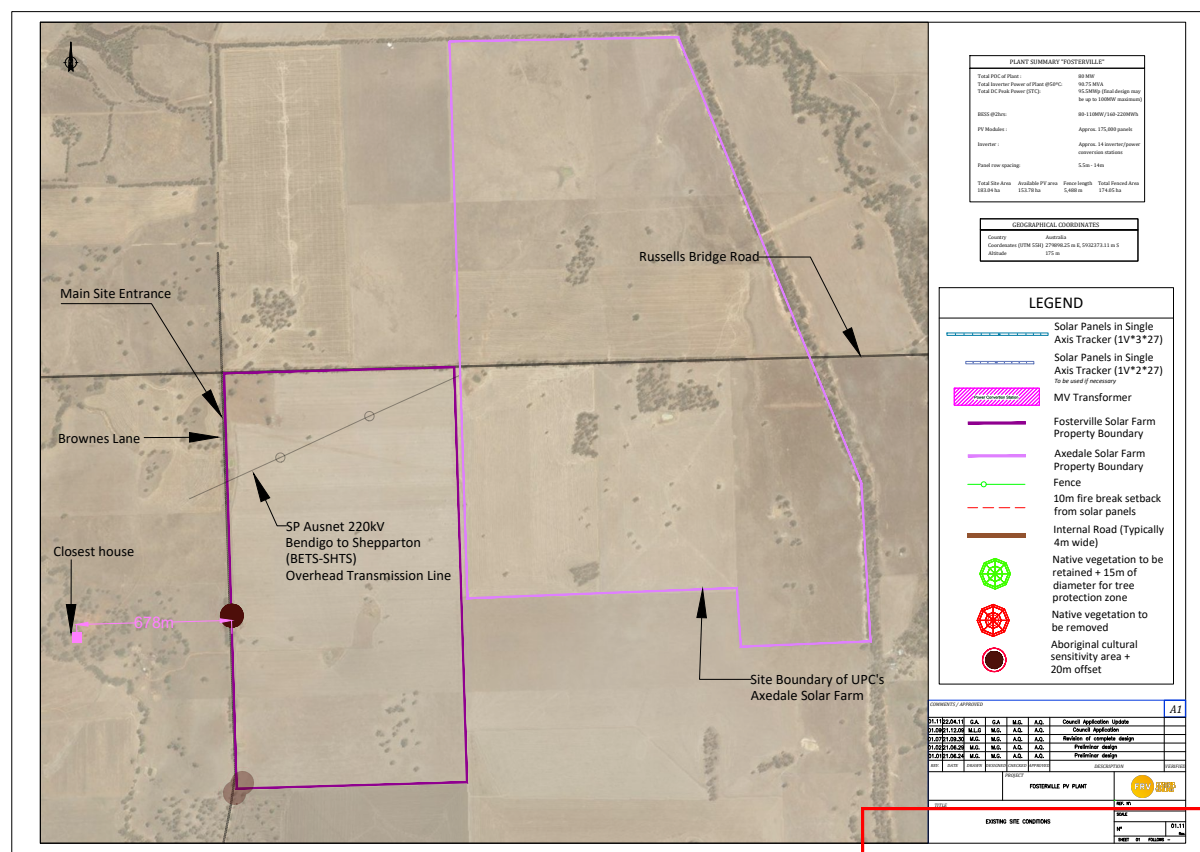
Fosterville Solar Farm Existing Conditions Plan
